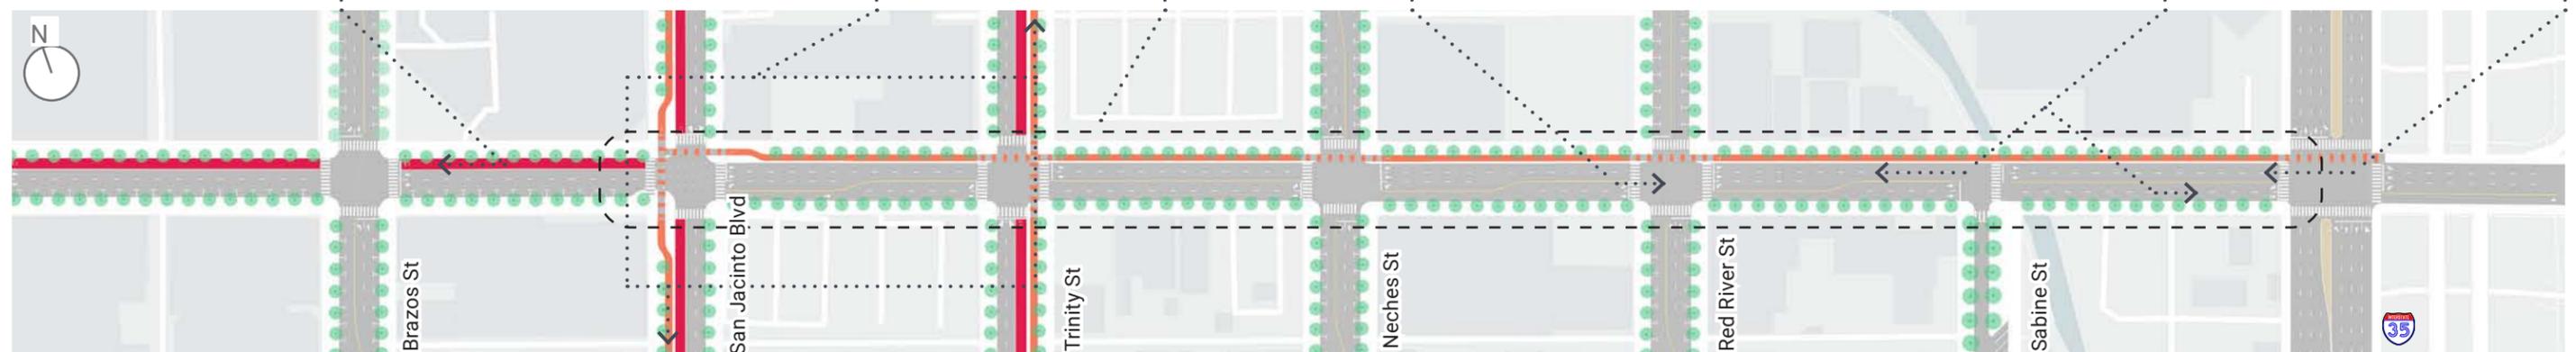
Seventh Street schematic I-35 to San Jacinto Boulevard
